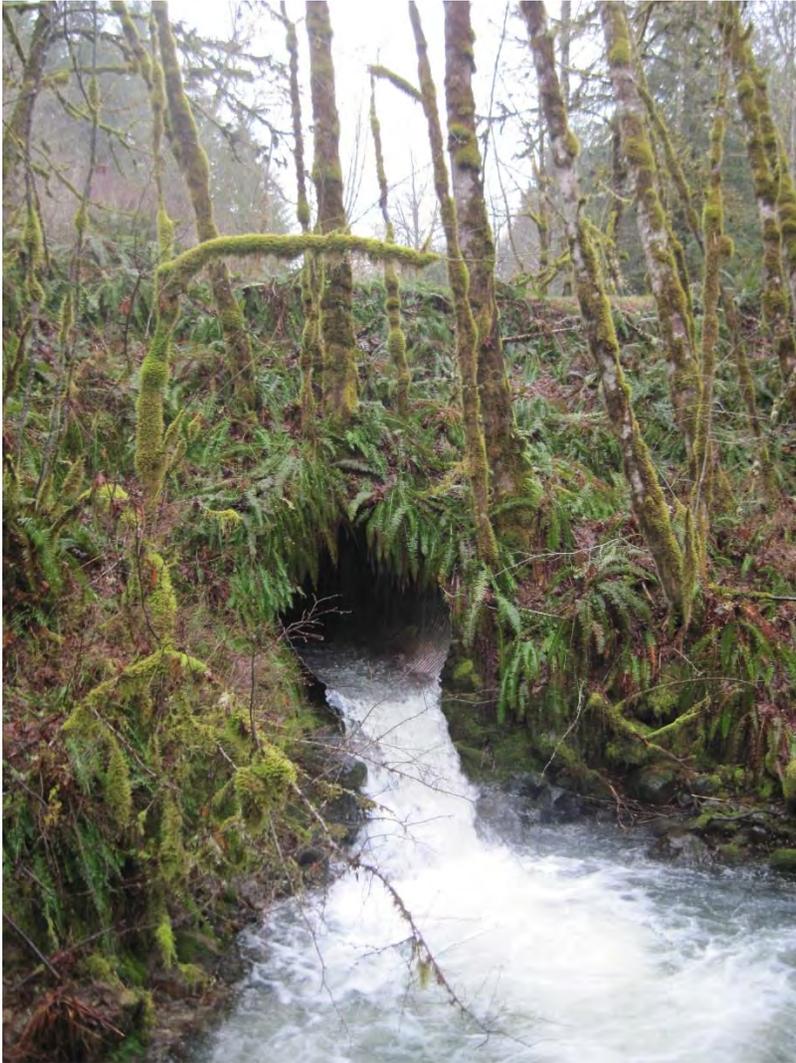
Little Rock Creek Outlet (Perched Culvert)
